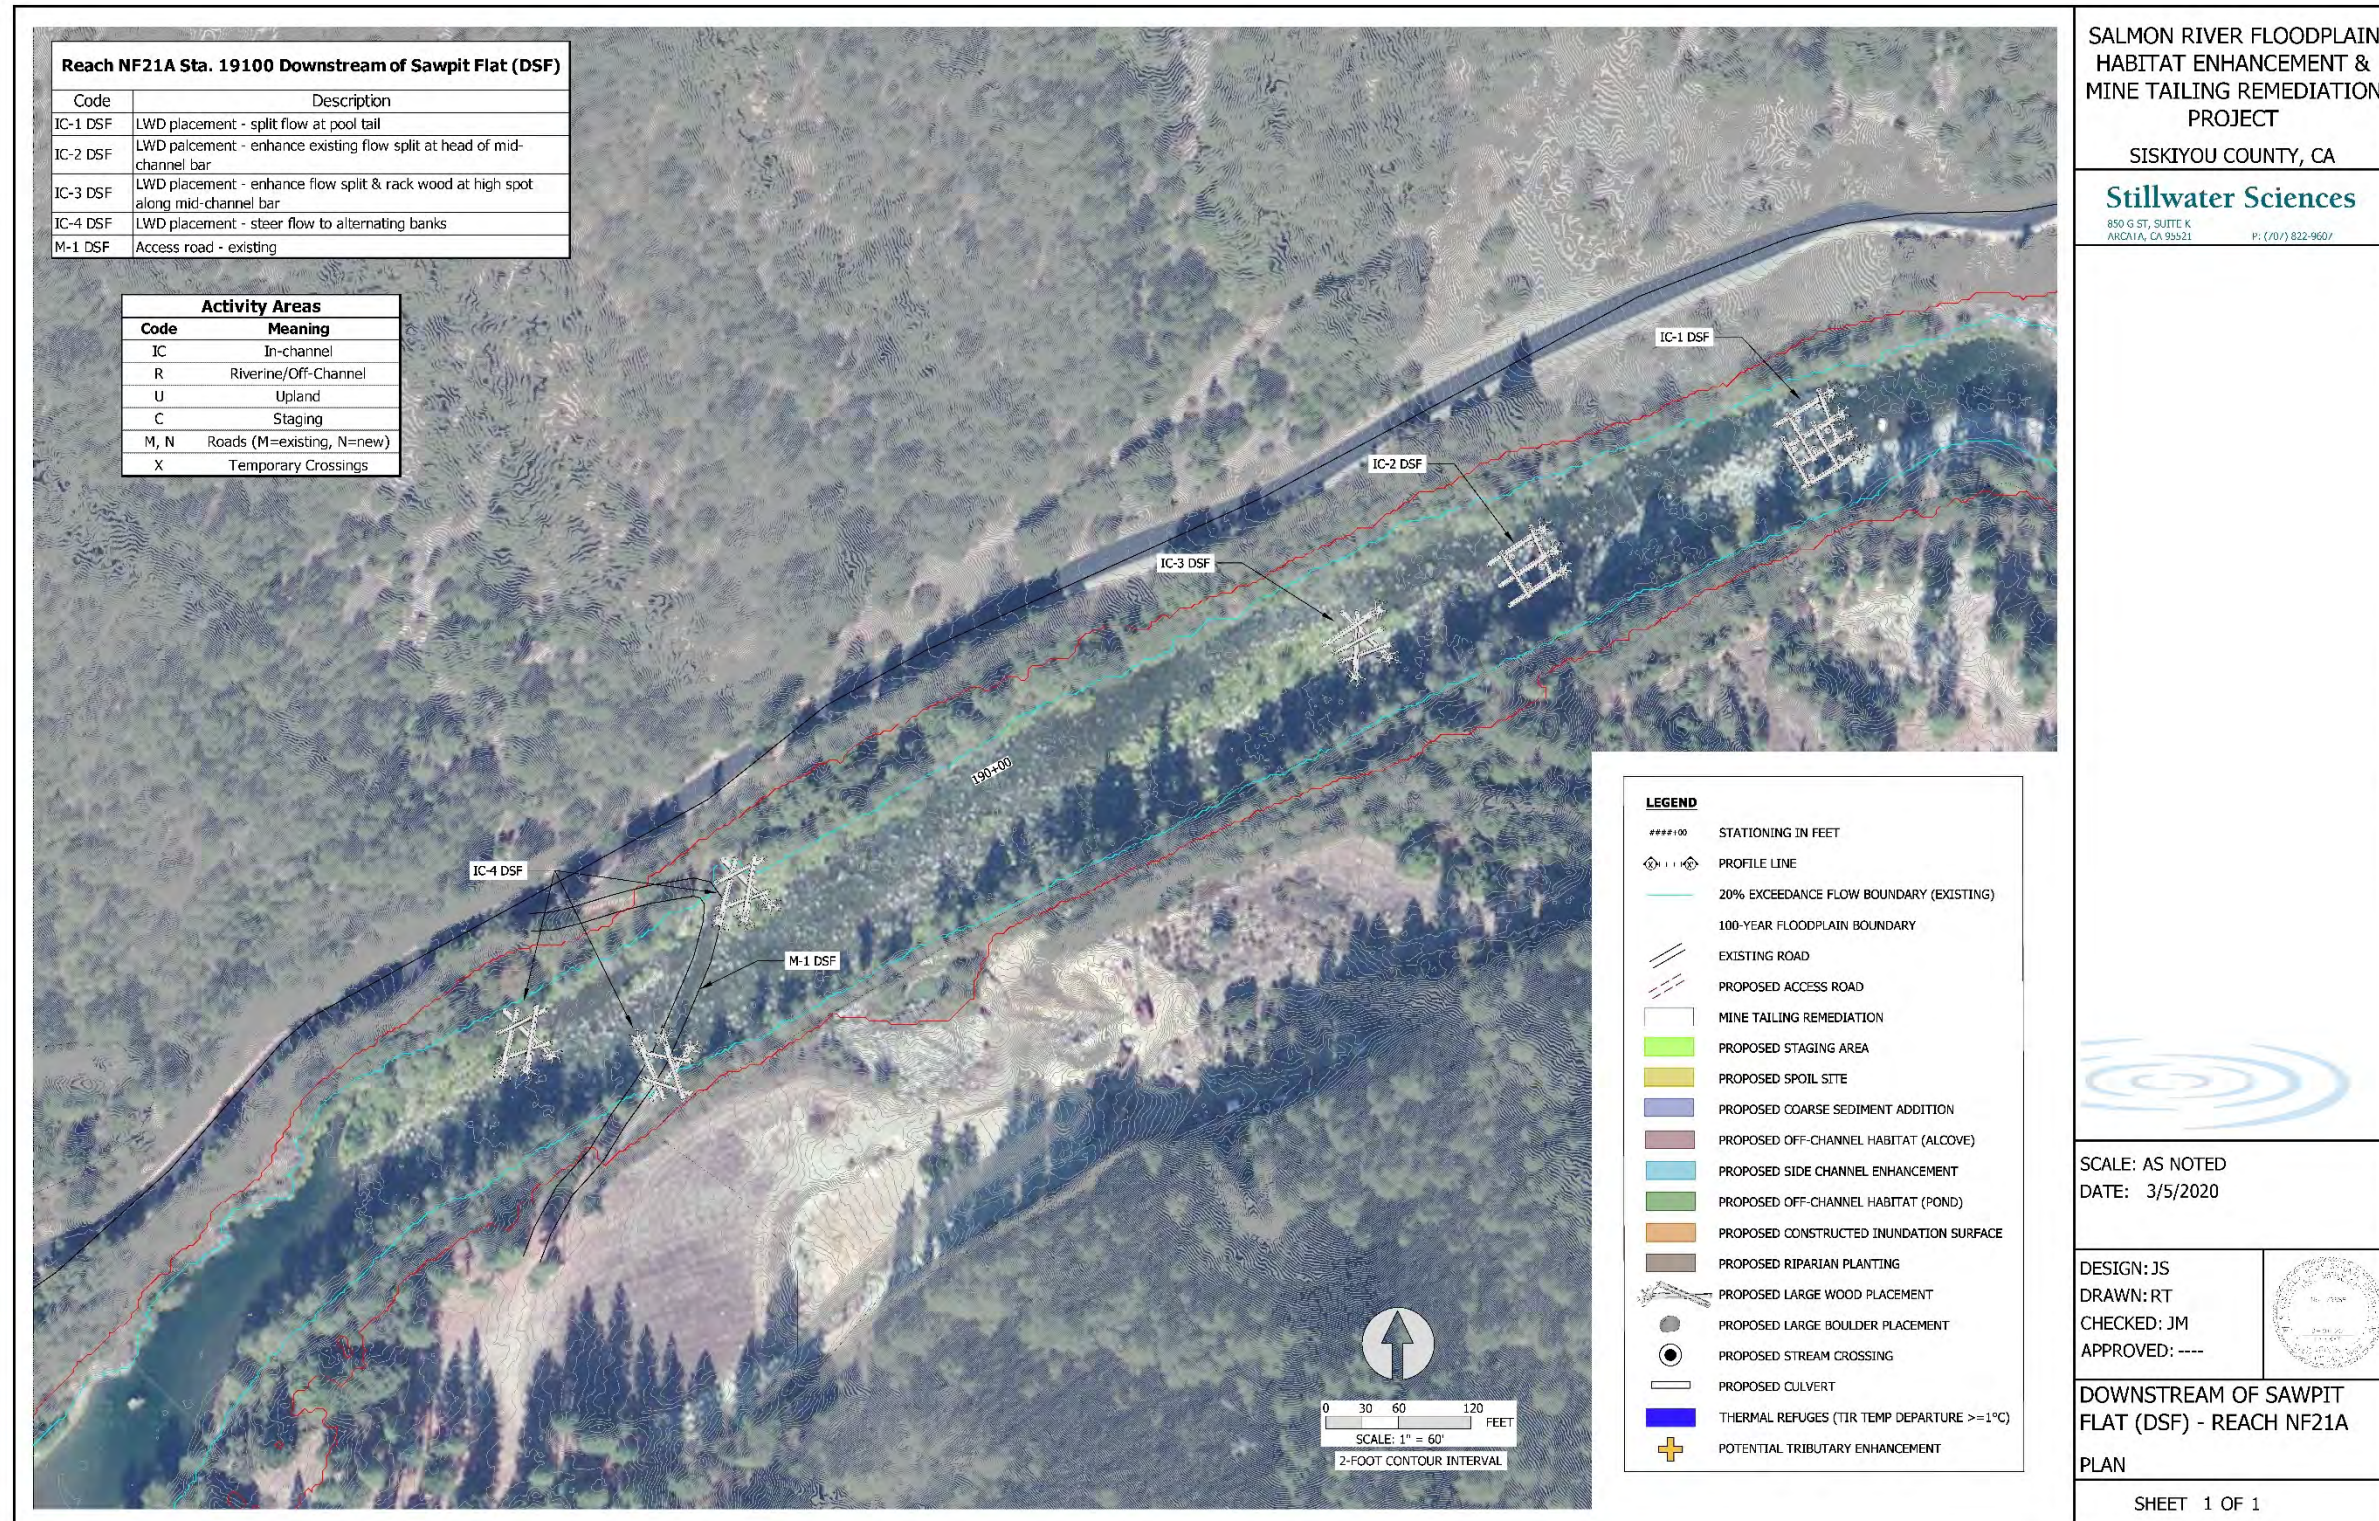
Design plan for North Fork Reach 21A Downstream of Sawpit Flat.
